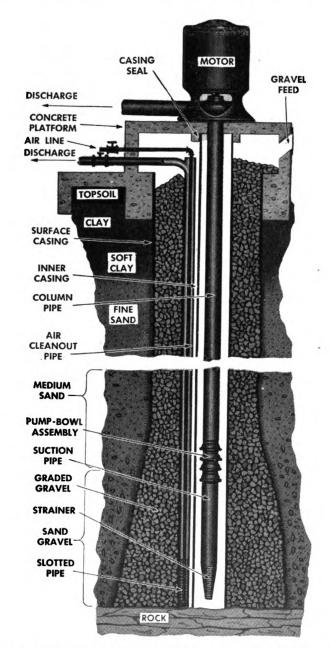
Large diameter gravel-wall well constructed by caisson method.
